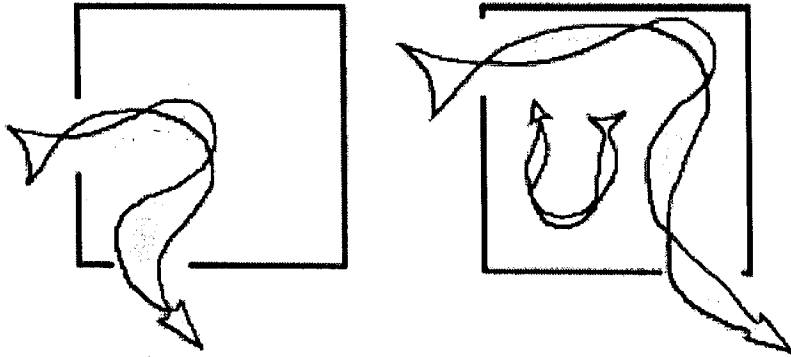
Window Arrangement for Cross Ventilation (Adjacent Walls).
